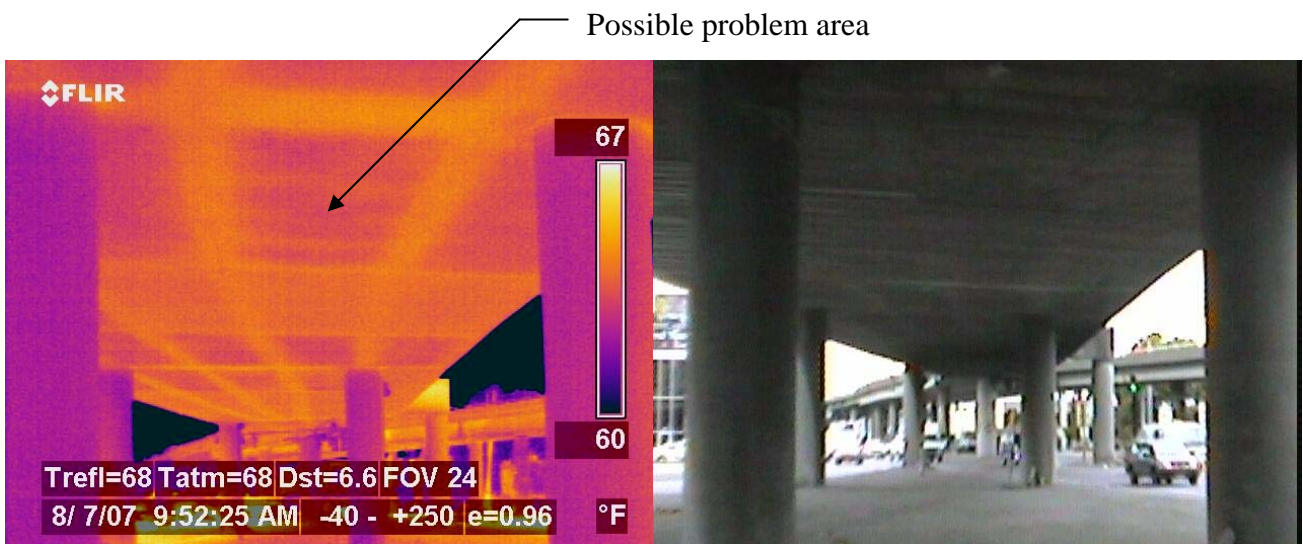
Thermal image and photo of box girder bridge under ambient conditions
